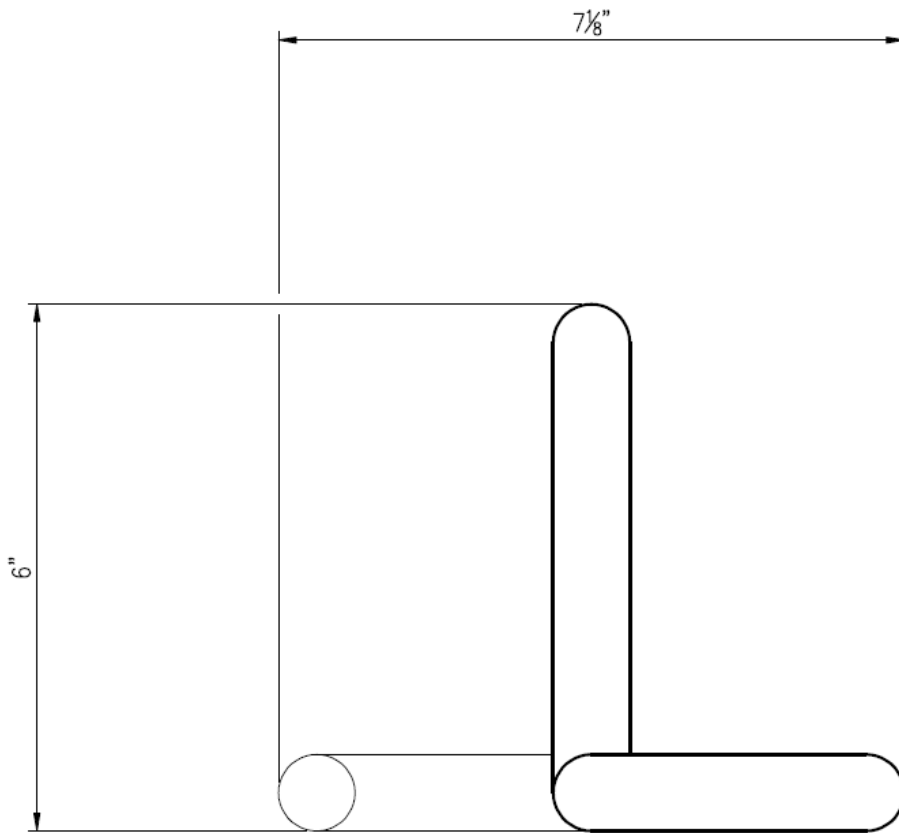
Pulling Iron Dimensions, Top View
